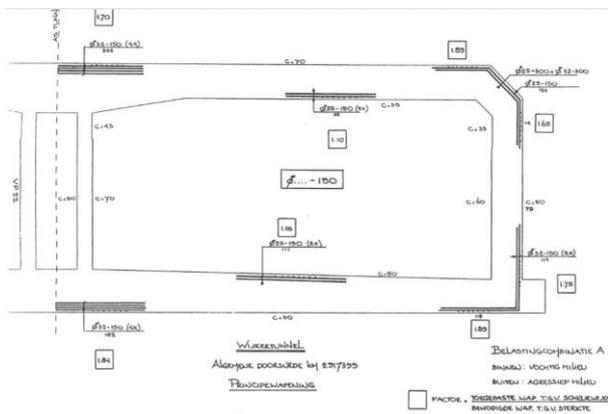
, TUNNEL CROSS-SECTIONAL REINFORCEMENT (PRELIMINARY)
